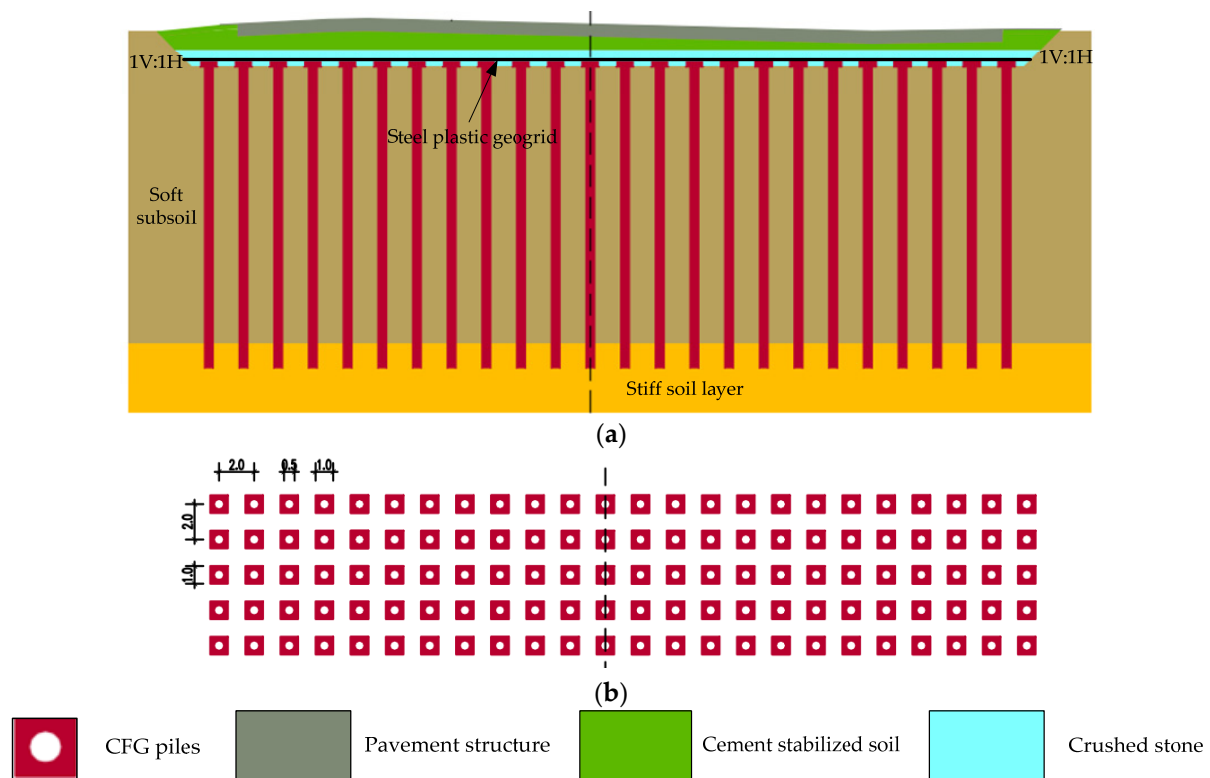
Treatment diagram of CFG pile-net composite foundation: (a) Cross section. (b) Pile location layout.
